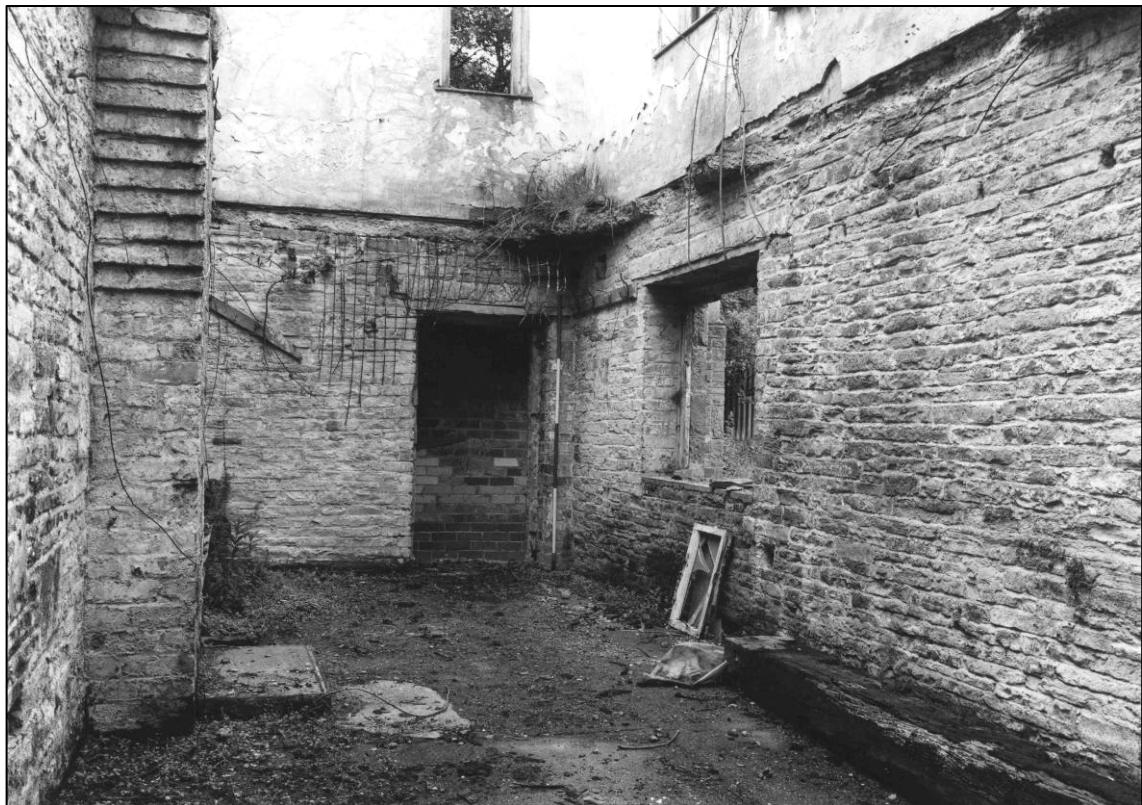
Building S1, ground floor interior, looking NW (photo 2/17).
